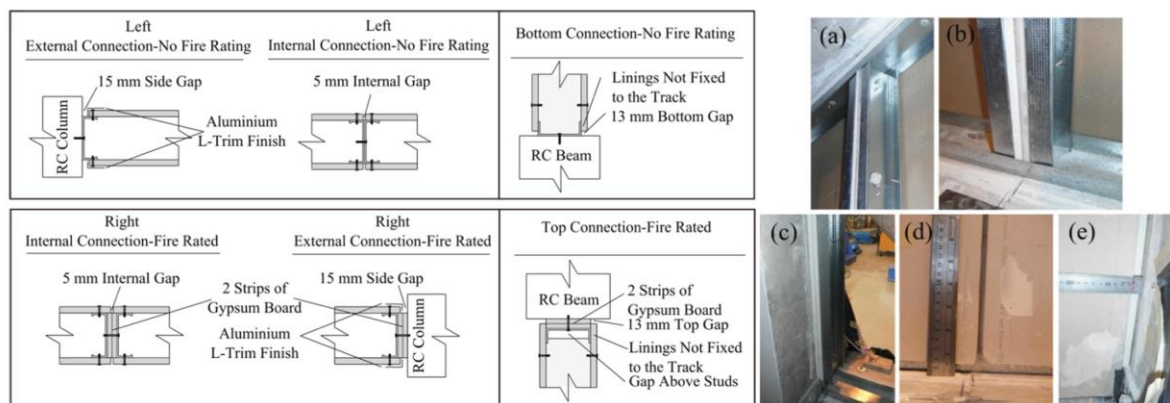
Adopted details in the low damage steel framed drywall specimen from study by Tasligedik *et al.* (2015): (a) & (b) fire rated internal stud, (c) fire rated external stud, (d) fire rated internal gap between adjacent linings, and (e) fire rated external gap between the lining and concrete.
